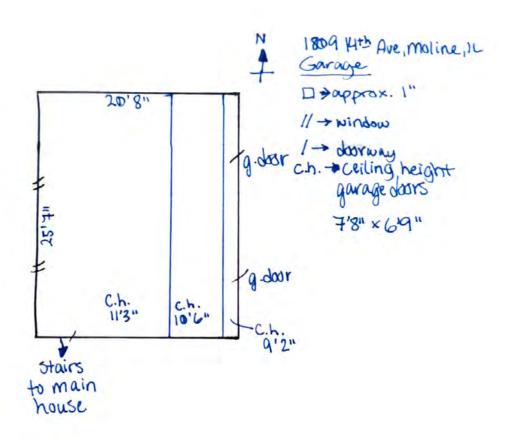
1809 14th Ave, Moline, Illinois, garage (main floor) floor plan, Terracon Consultants, Inc., 2025
